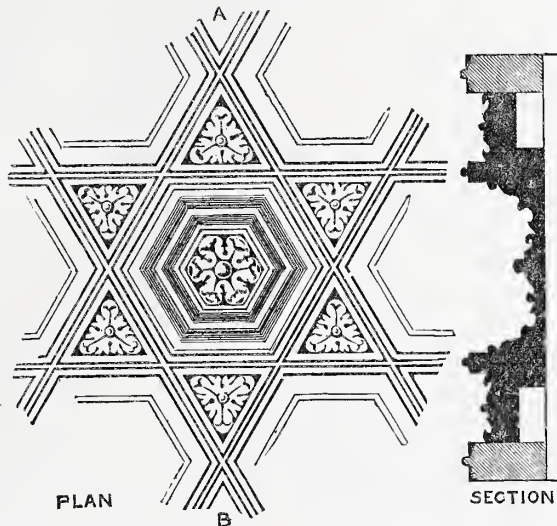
Single Compartment in Plan, and Section along A, B, in Plan. Café del Comercio, Murcia, Spain.
